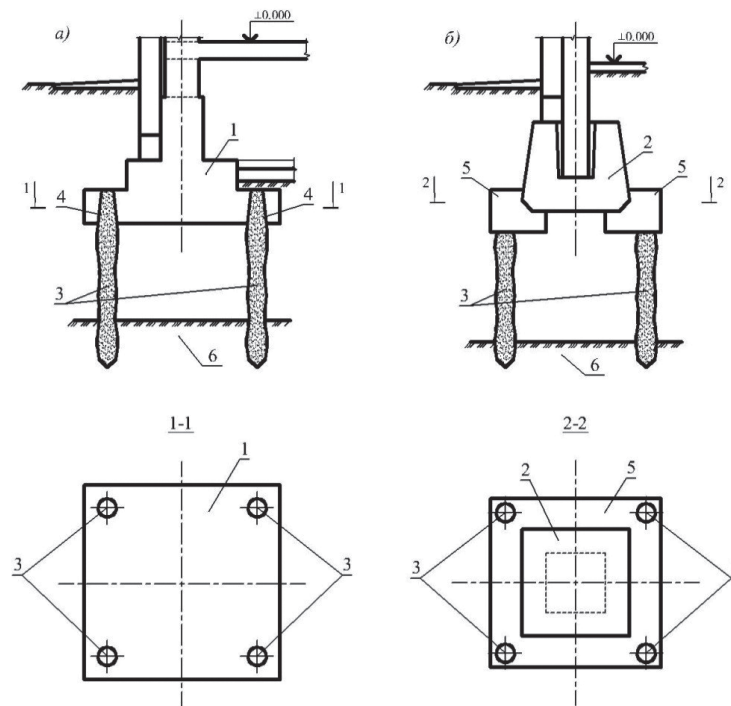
Methods for installing injection piles when strengthening individual foundations of reconstructed buildings: a, b – respectively, under the sole of the existing separate foundation and adjacent to its perimeter; 1 – existing separate monolithic reinforced concrete foundation; 2 – existing separate precast reinforced concrete foundation; 3 – injection pile; 4 – a tapered hole in the slab part of the existing foundation; 5 – reinforced concrete cage, arranged along the perimeter of the foundation; 6 – bearing layer of solid (low-compressive) soil
